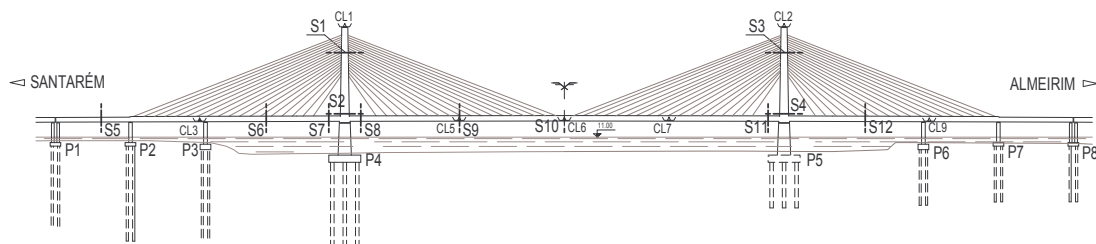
General observation plan of the Salgueiro Maia cable-stayed bridge
